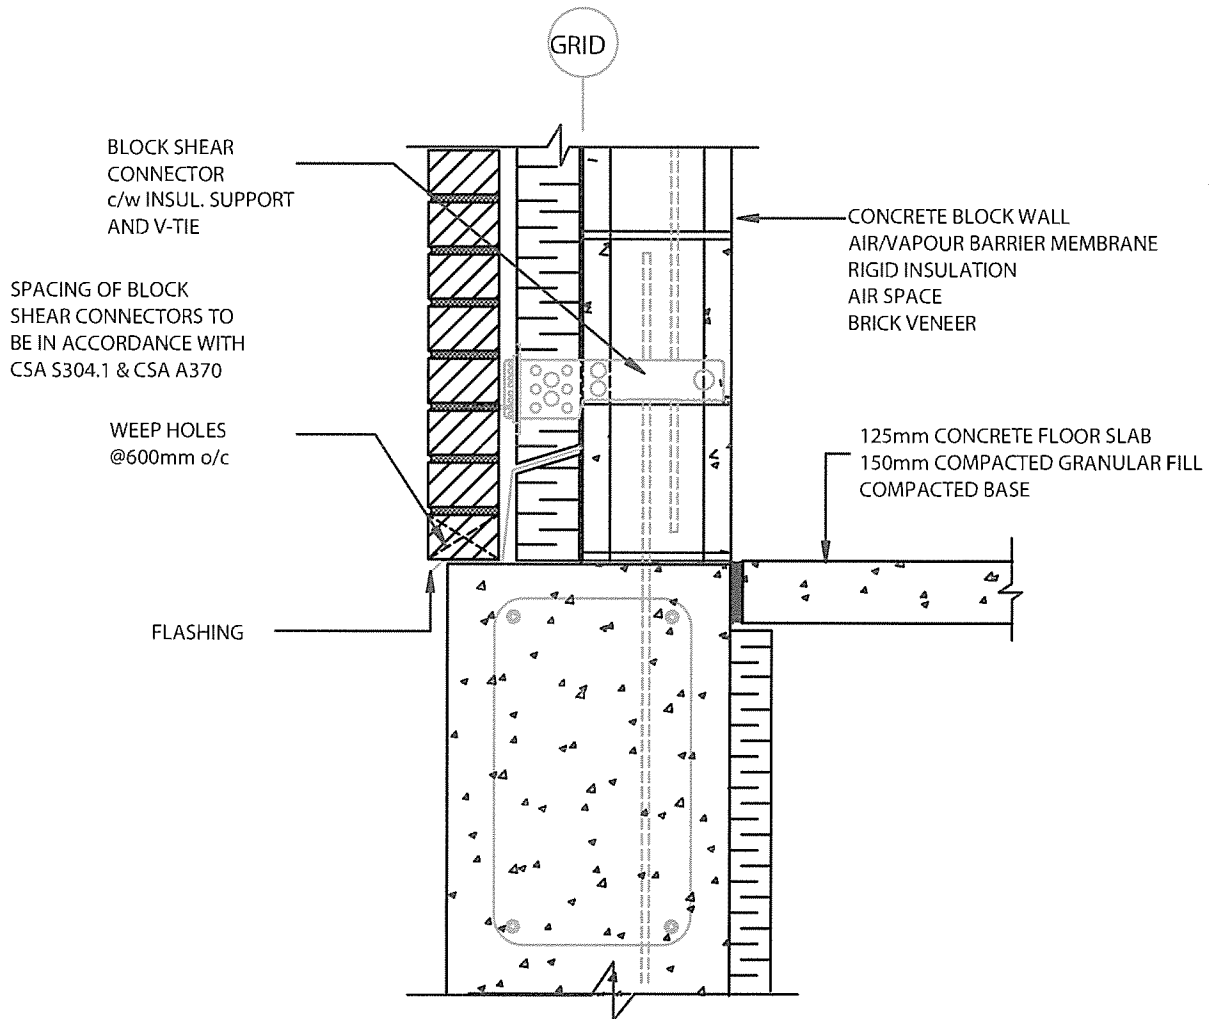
BRICK VENEER/CONCRETE BLOCK - AT FOUNDATION
